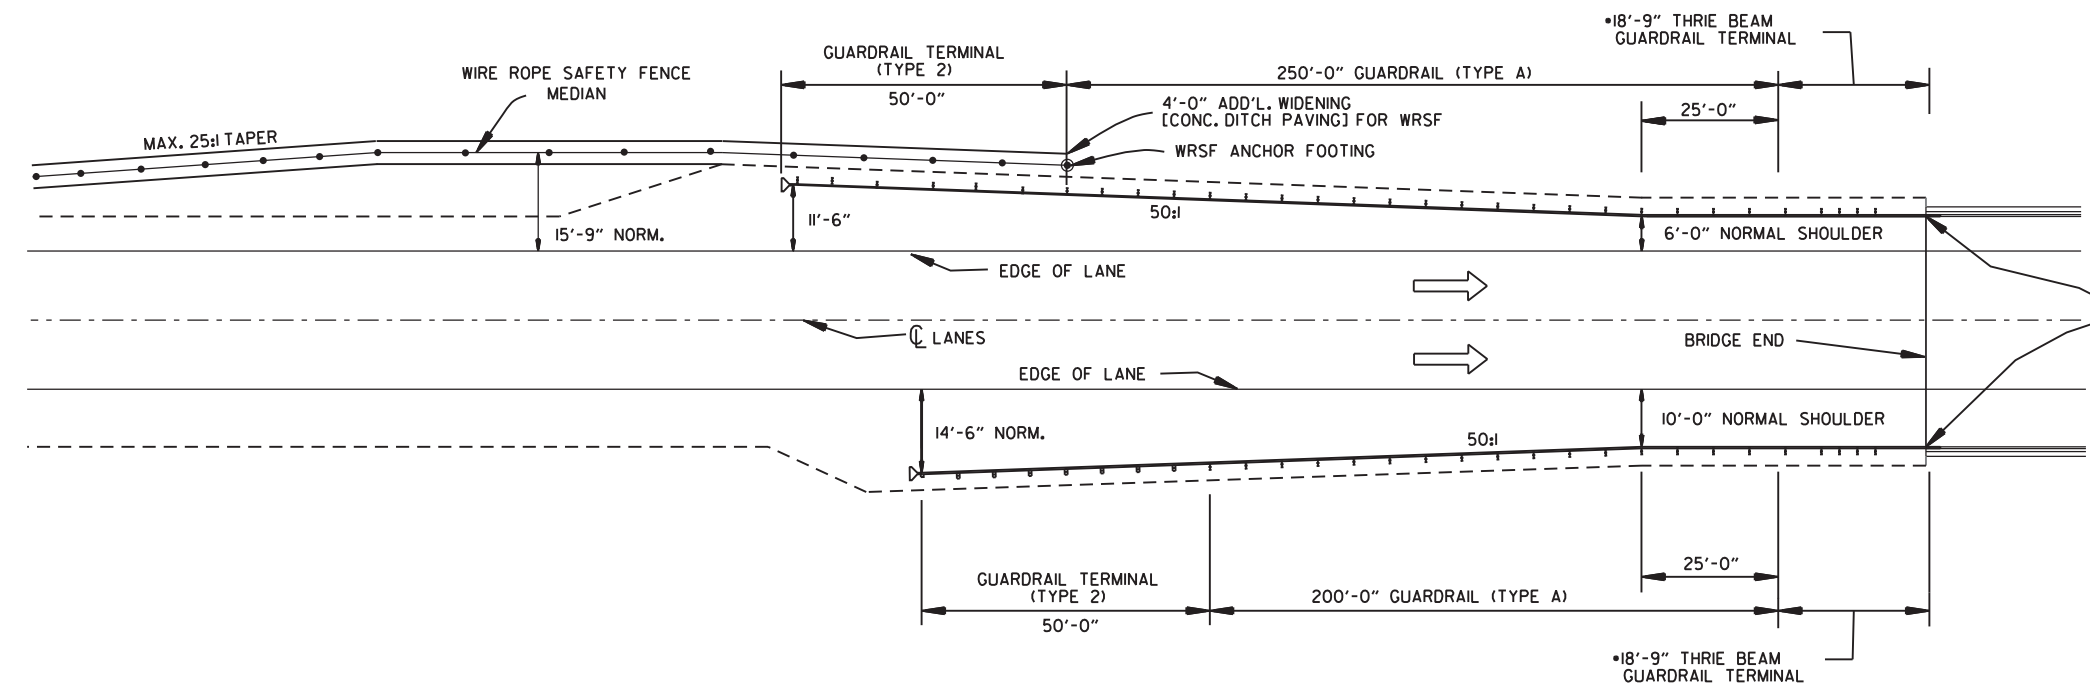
DETAIL OF CONCRETE DITCH PAVING AT GUARDRAIL LOCATIONS
